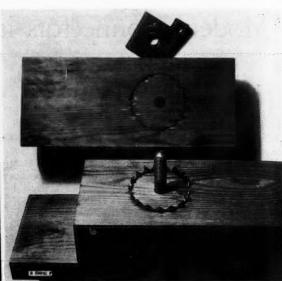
(Right) Details of toothed-ring connector joint assembly
